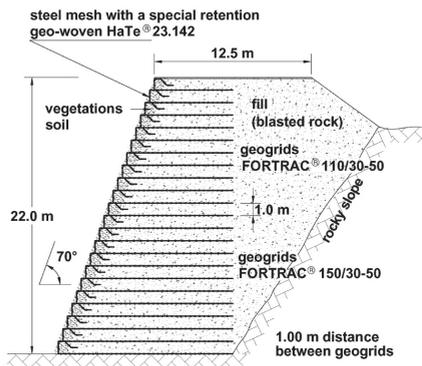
Typical cross section of the geogrid-reinforced motorway embankment at Etxegarate.
